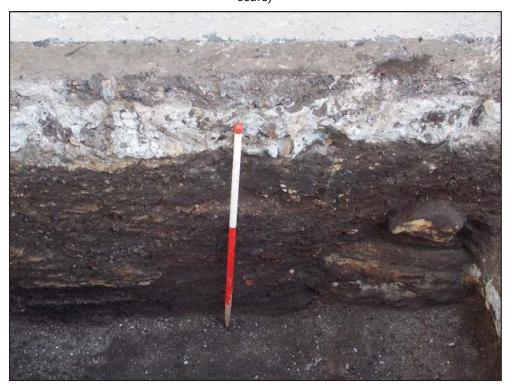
; Southern end of Trench 2 showing wall {215}, looking south-southeast (1m scale)
